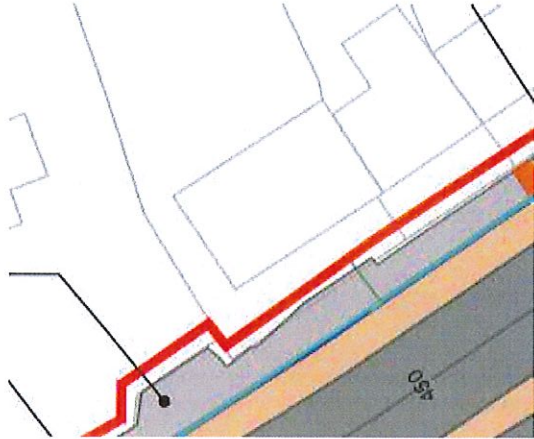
DR-P8-02 Rev PL1, Lisbrack Road Junction.
